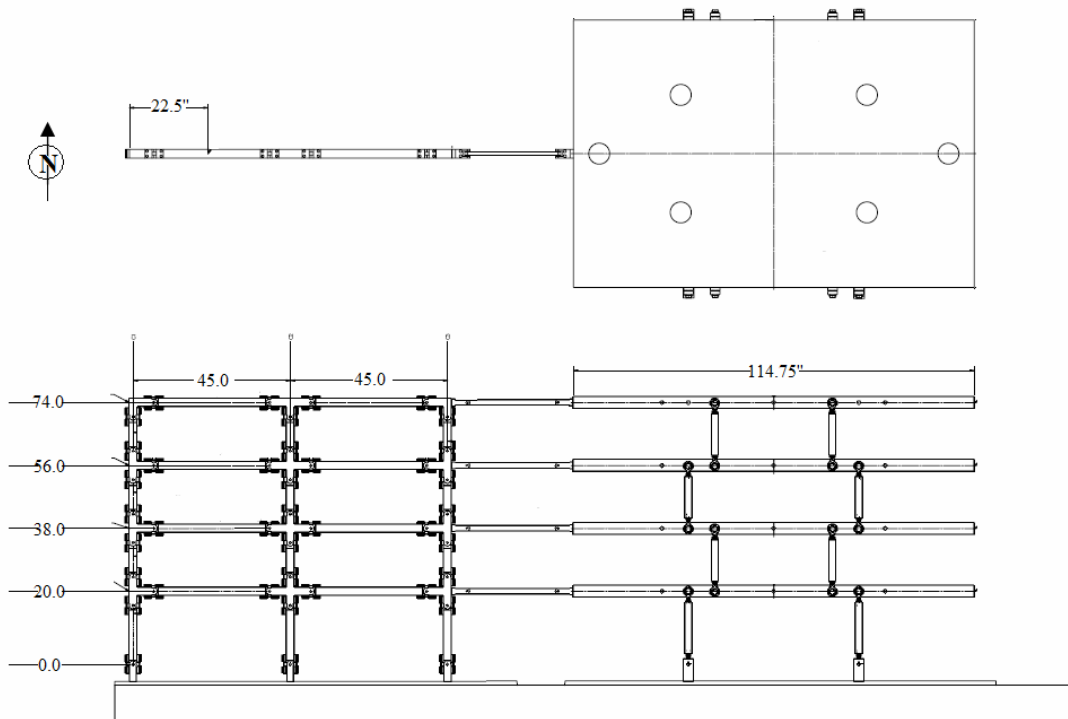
Plan view and elevation of the scale model of the EW moment frame and mass simulator
